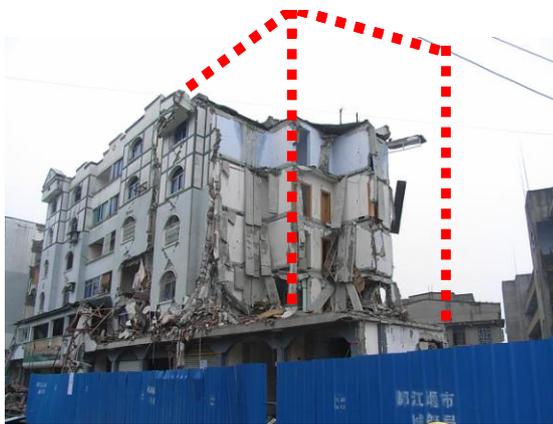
Partially Collapsed Brick Buildings with Precast Concrete Hollow-core Slabs (Dujiangyan City)
